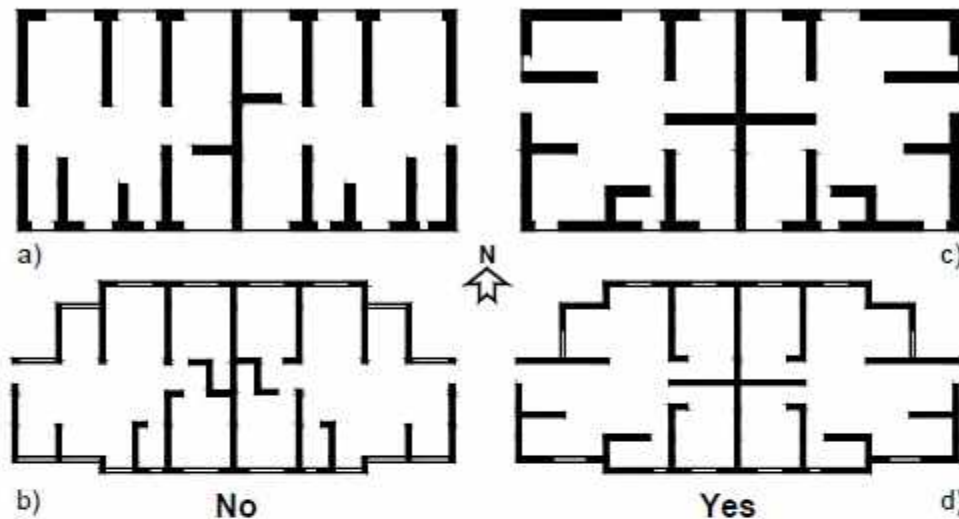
Wall distribution in plan: a) and b) not enough walls in the E-W direction; c) and d) possibly adequate wall lengths in both N-S and E-W directions (note a few strong walls on the perimeter of the plan).
